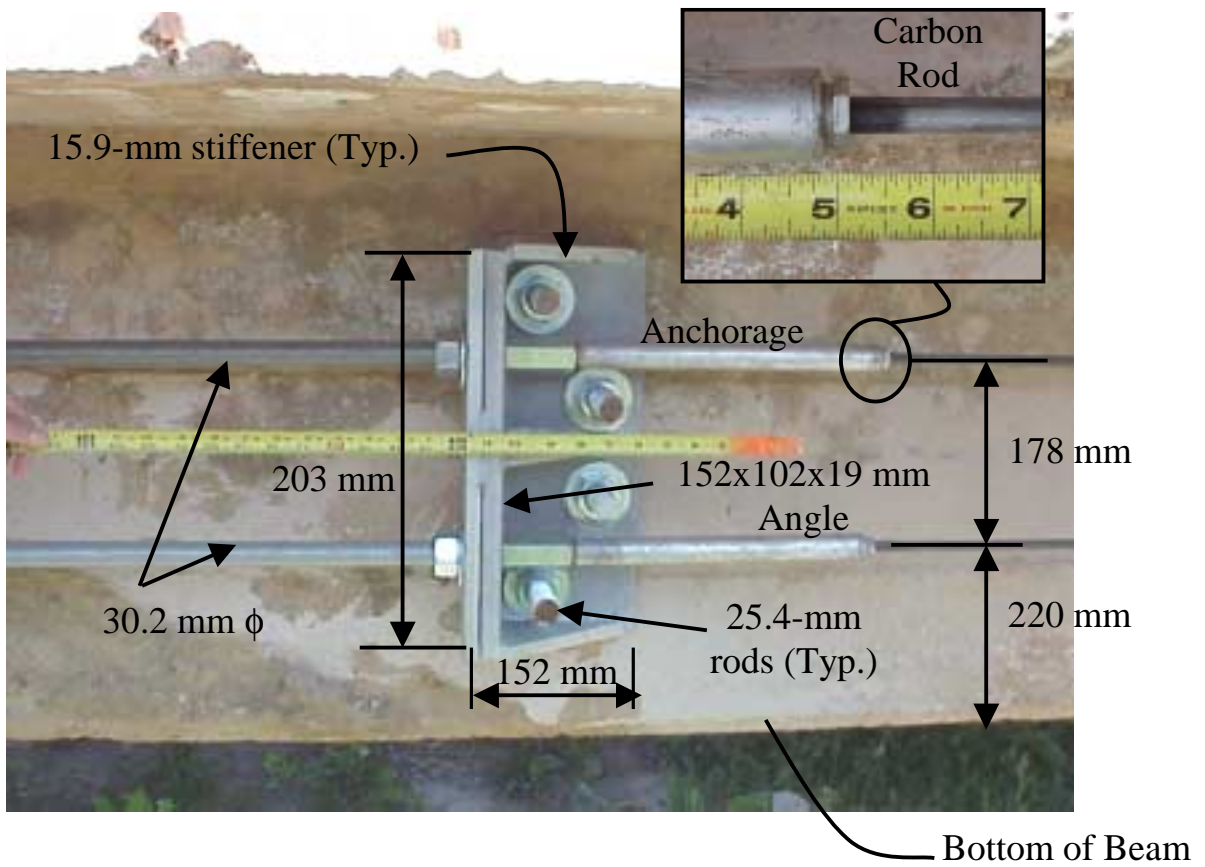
Elevation Views of Anchor System in Web of Beam 1
